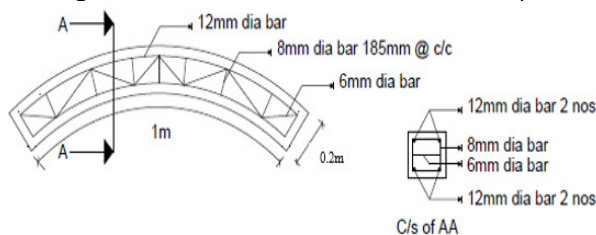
A3 – Beam with vertical stirrups and zig-zag horizontal stirrups.
